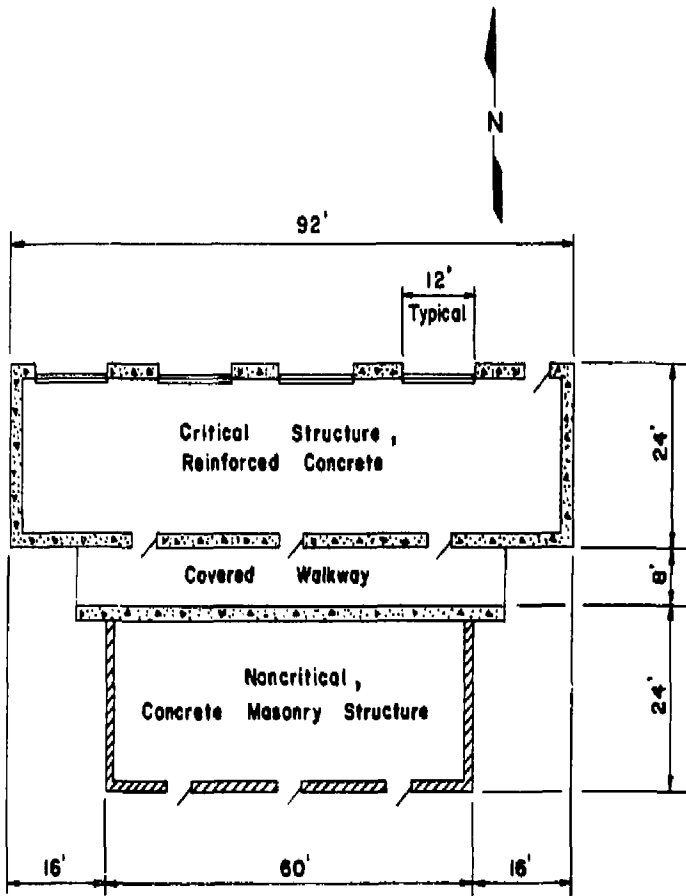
PLAN VIEW OF EXAMPLE STRUCTURE
